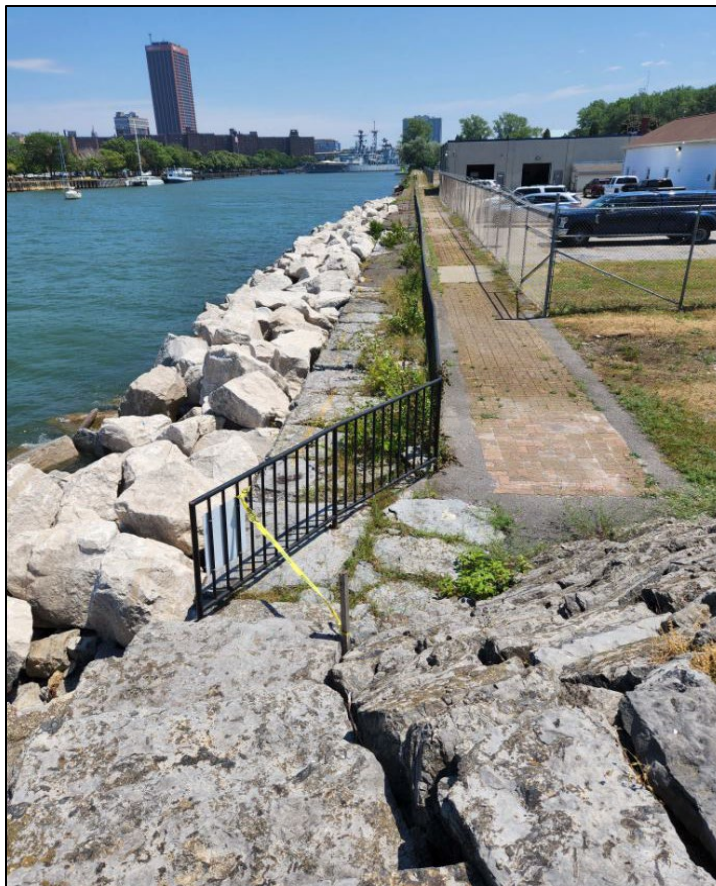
Looking west along concrete paver pathway placed here in 2021 (photo by ERDC-CERL researchers, 2022).
